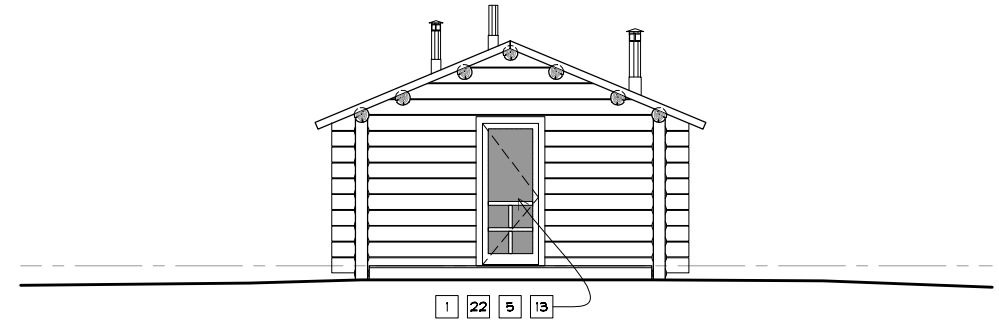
through 148 show the existing conditions of Harry's Cabin.
